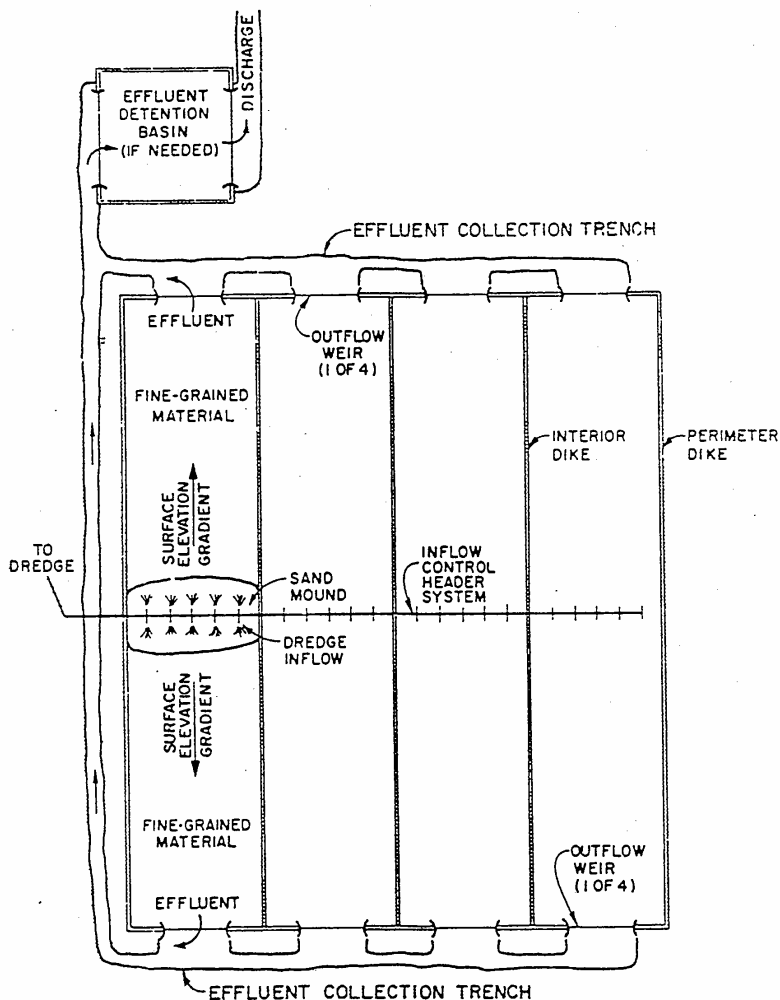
Conceptual illustration of disposal site layout to permit parallel compartment use and produce surface topography facilitating future dredged material dewatering
